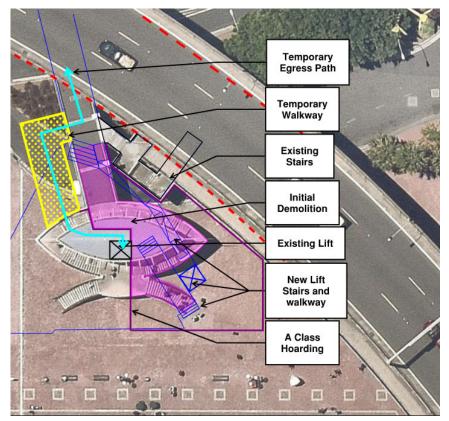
Druitt Street Bridge Access Staged Methodology Option A
